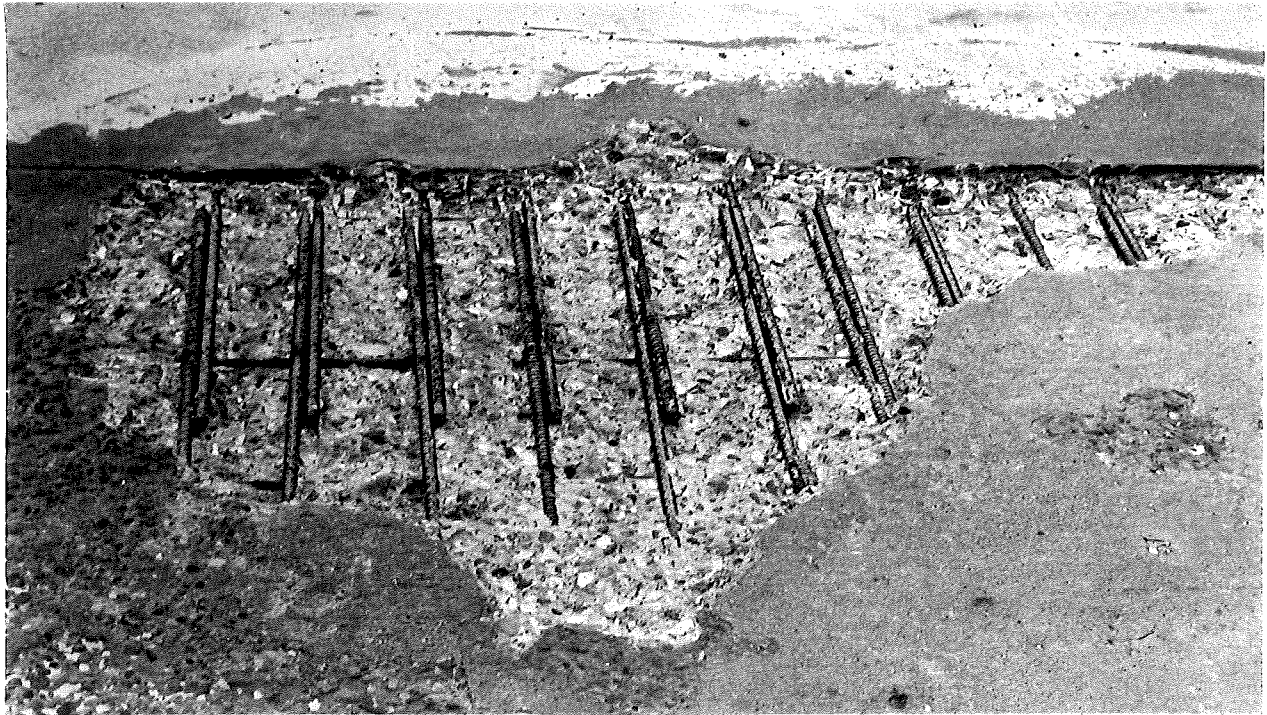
Deeply scaled and spalled area prior to patching near east curb of Span 3 on US 127 bridge over NYC RR, north of Jackson (5-17-66).
